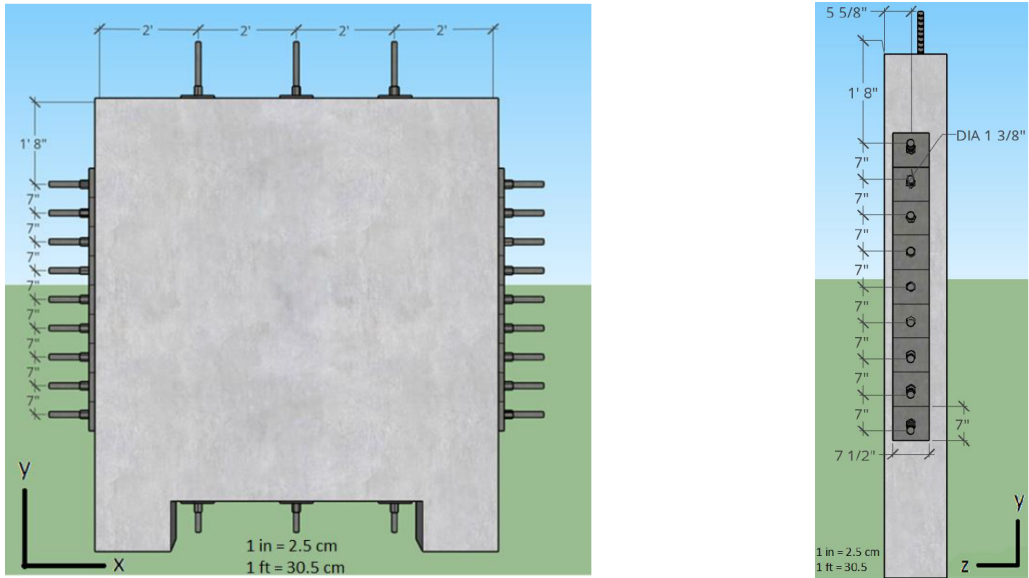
Texas A&M Specimen 1 post-tensioning bar layout. (Kelley, 2018)
